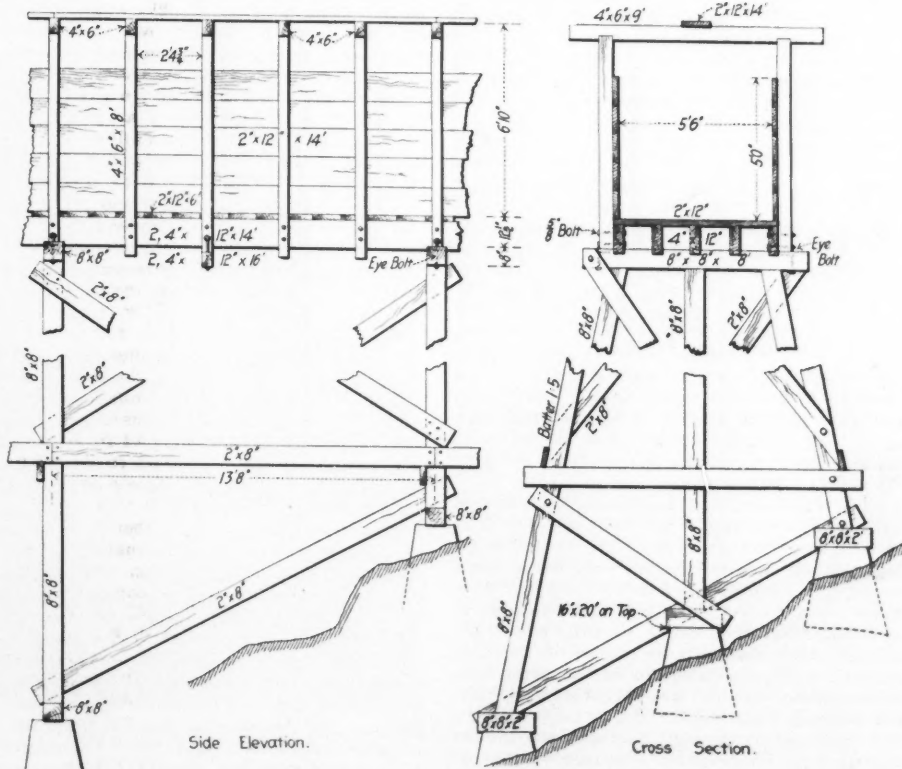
DETAILS OF FLUME CONSTRUCTION.
